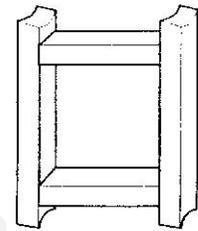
Noncombustible wall opening must be 7 1/2\"/>
